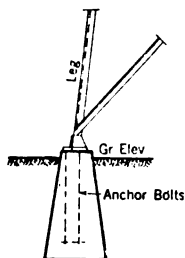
SHOWING CONCRETE FOOTING WITH ANCHOR BOLTS FOR ATTACHING THE LOWER LEG
